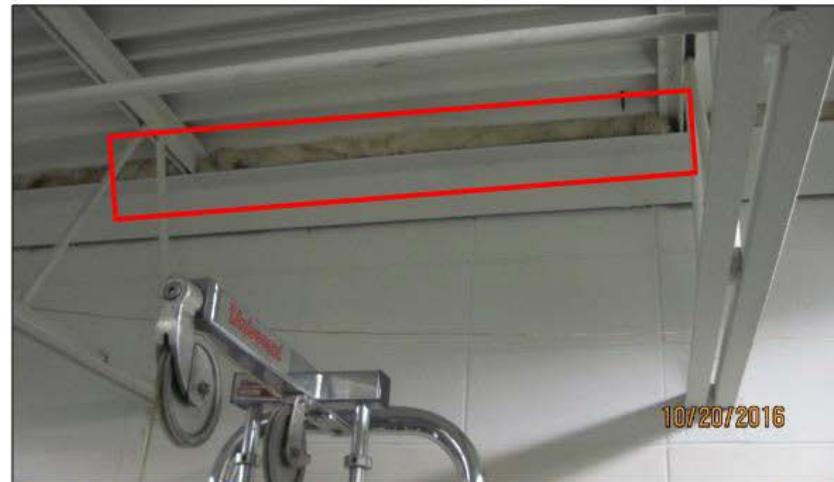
Image from inside the gym. The law enforcement garage and conjoined spaces appear to be sealed and insulated with fiberglass insulation.
